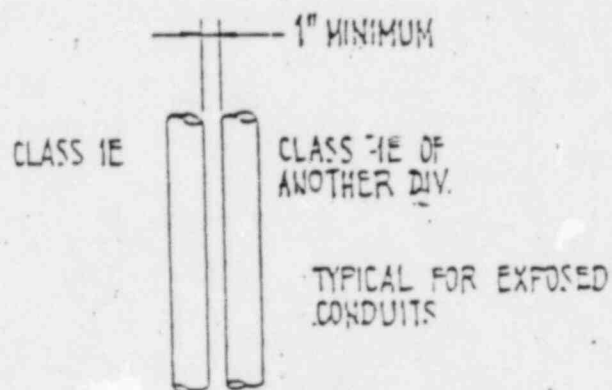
CONDUIT SPATIAL SEPARATION:
